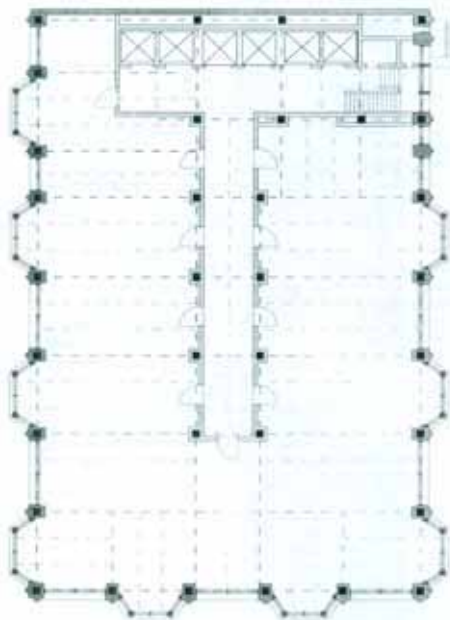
A floor plan of the Fisher Building, showing the central corridor and the small section at the top right, which is highlighted with a cross-hatch pattern.
